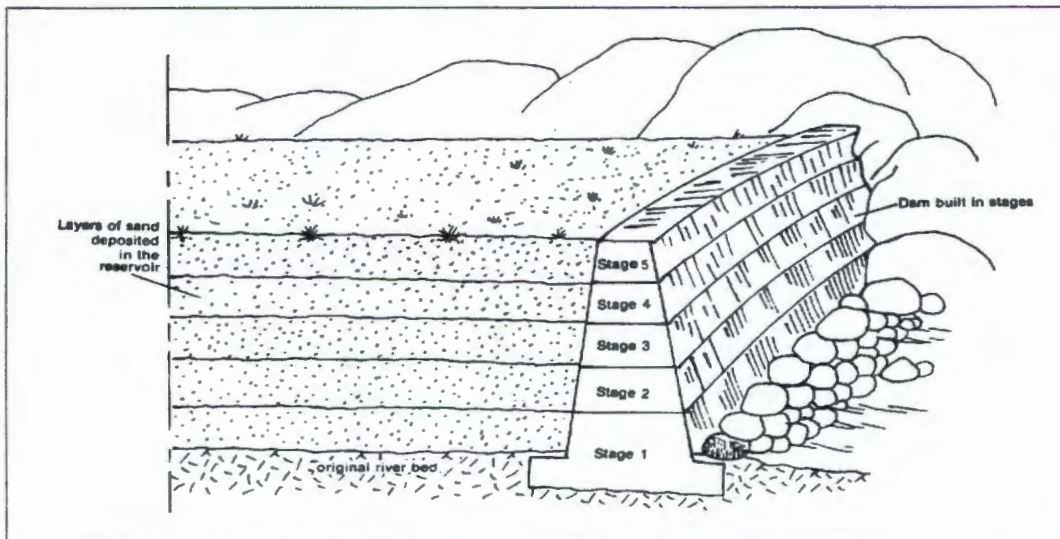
Construction principle of a sand-storage dam (from Nilsson, 1988)
